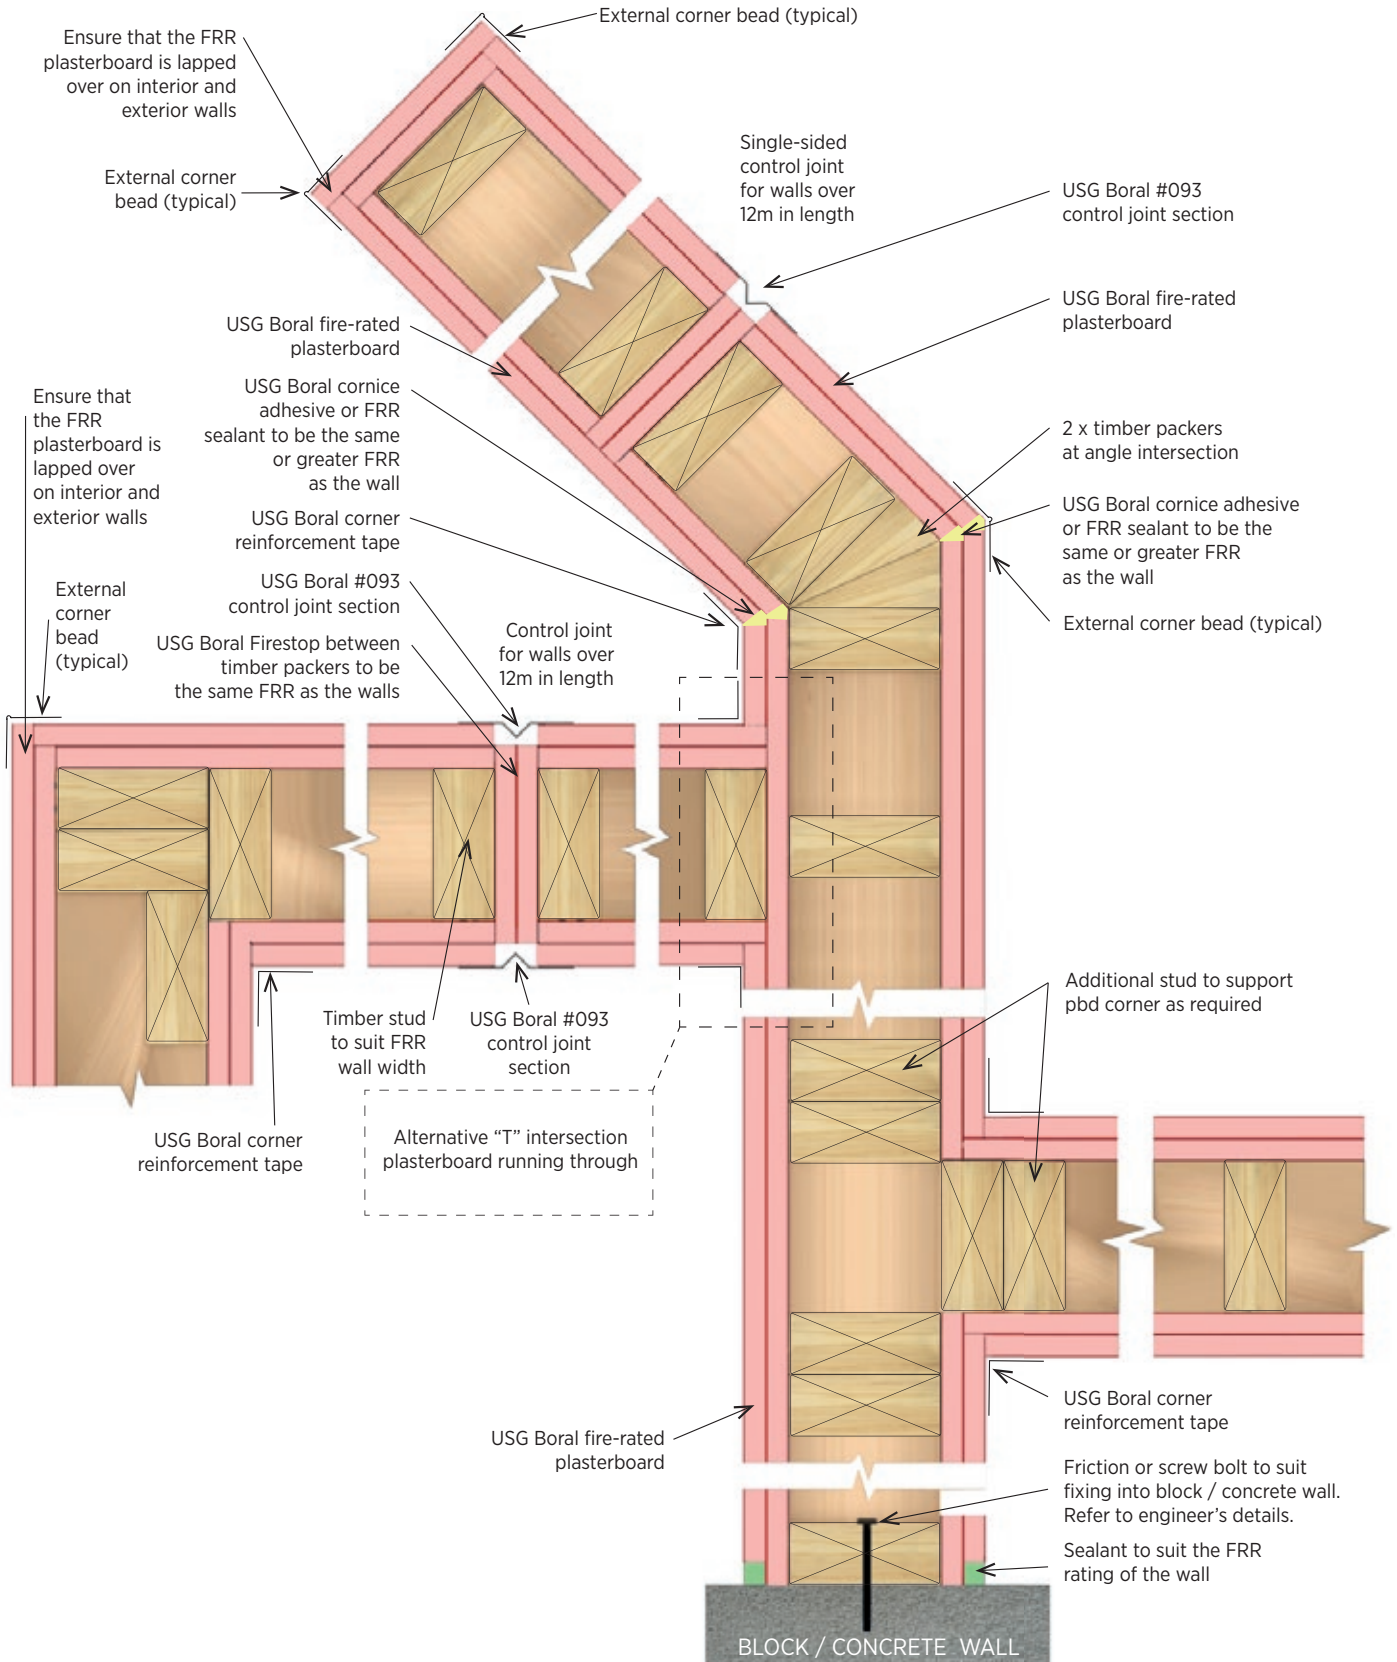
Multi-lining Terminal, Control Joint and Junction Details
